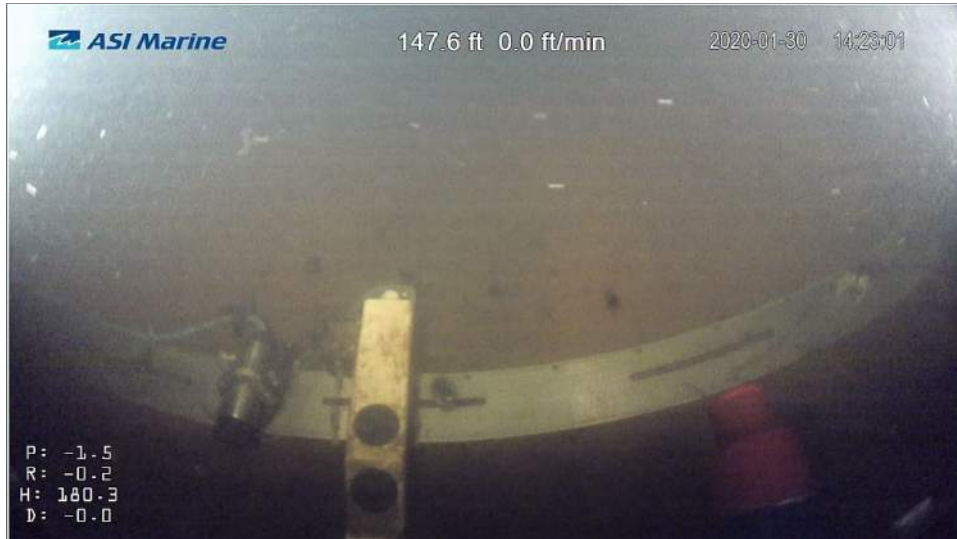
Instrumentation on invert 148 feet downstream of Access Point 1.
